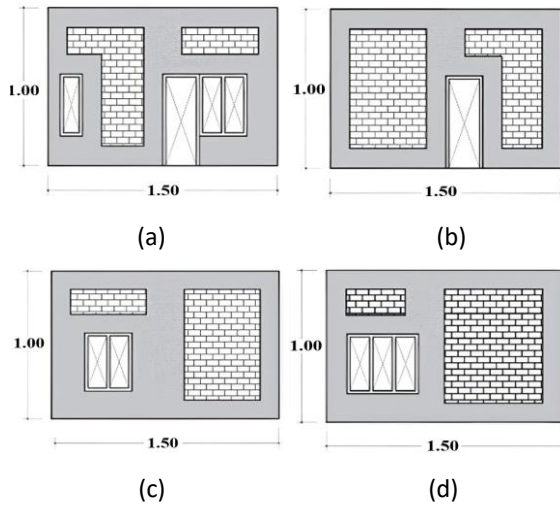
Elevation view of the specimen RH; a) Front view, b) Back view, c) Left side view, and d) Right side view
